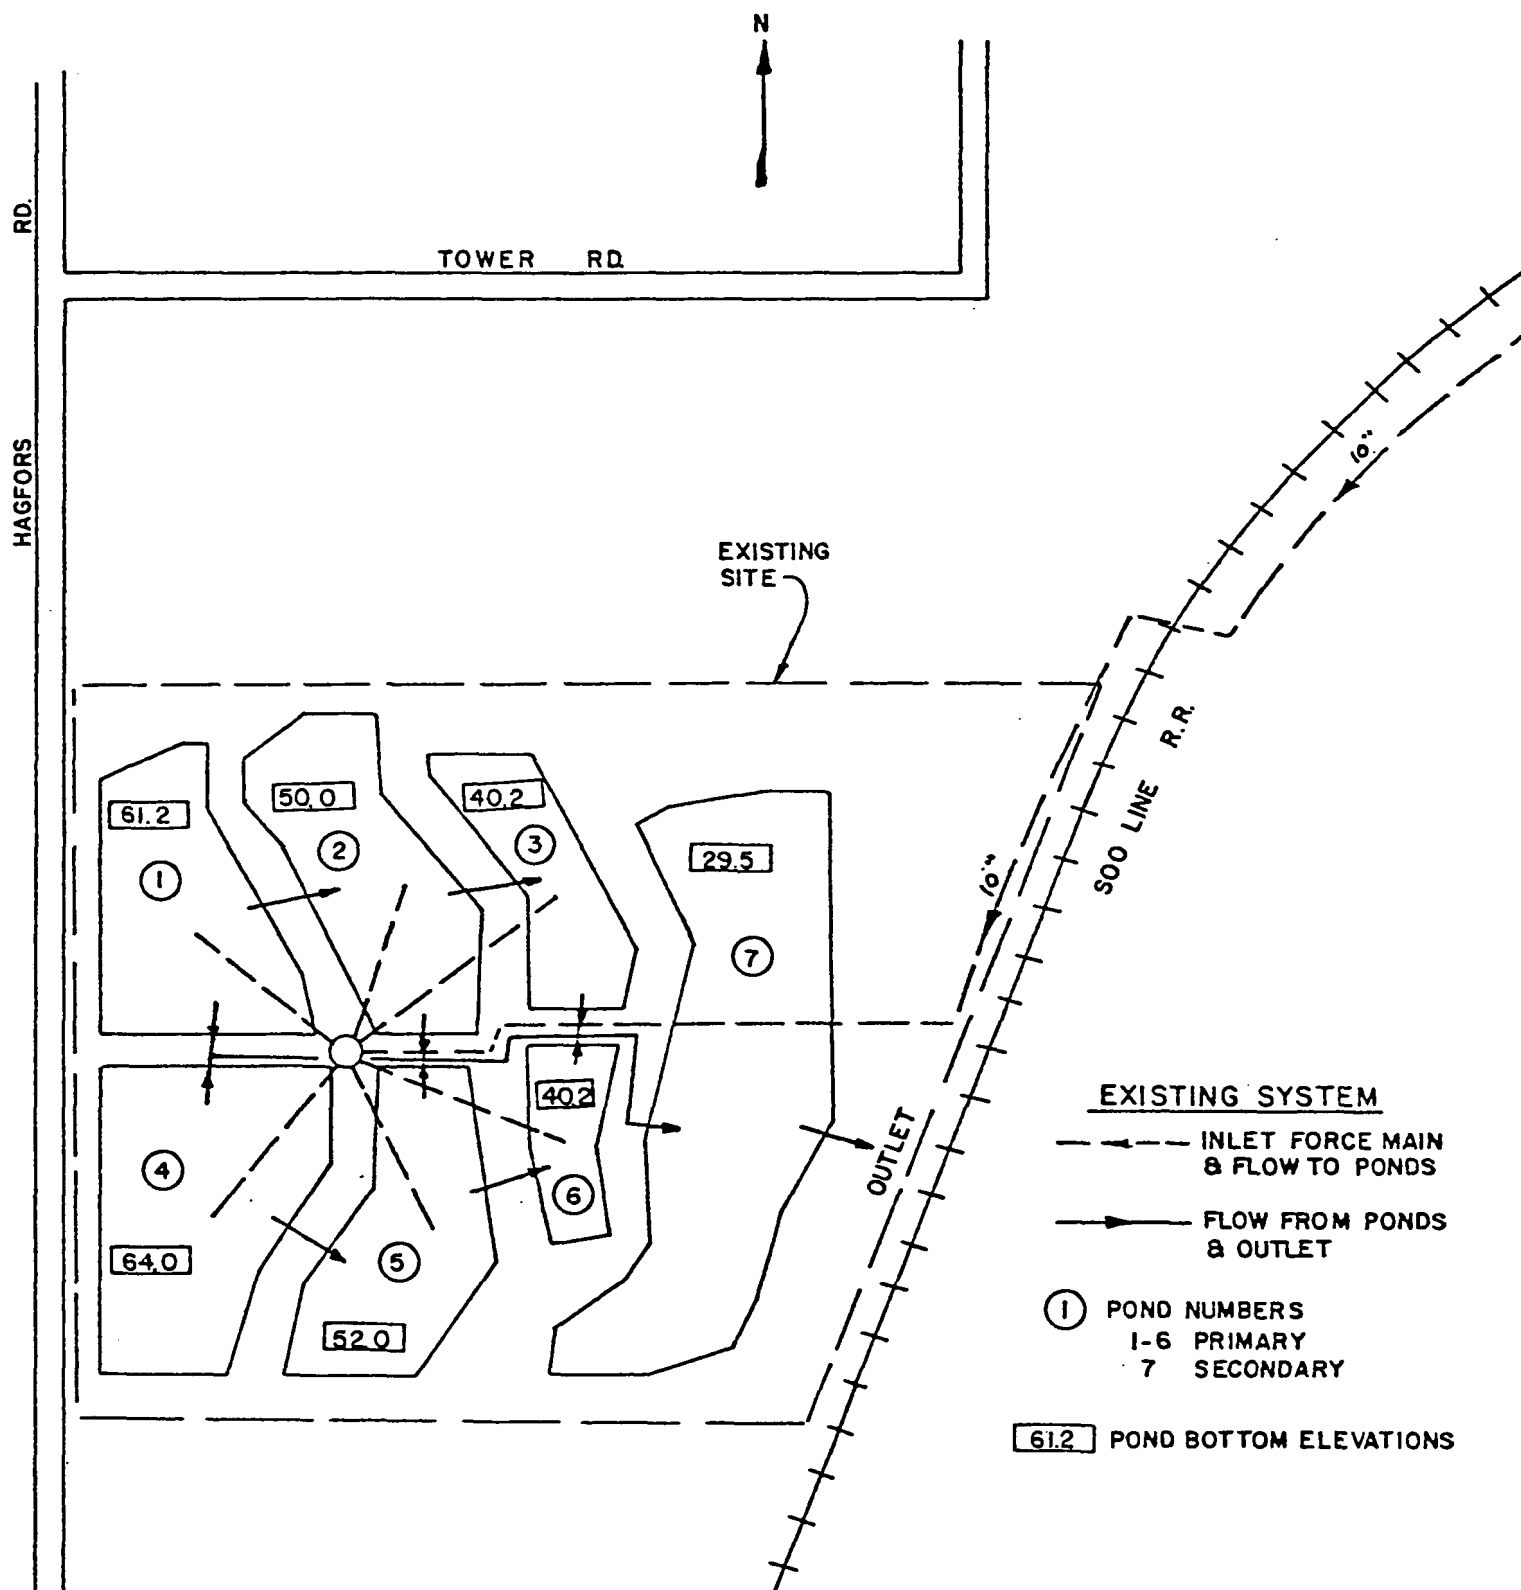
Plan view of existing wastewater treatment lagoons for the City of Moose Lake treatment plant.
